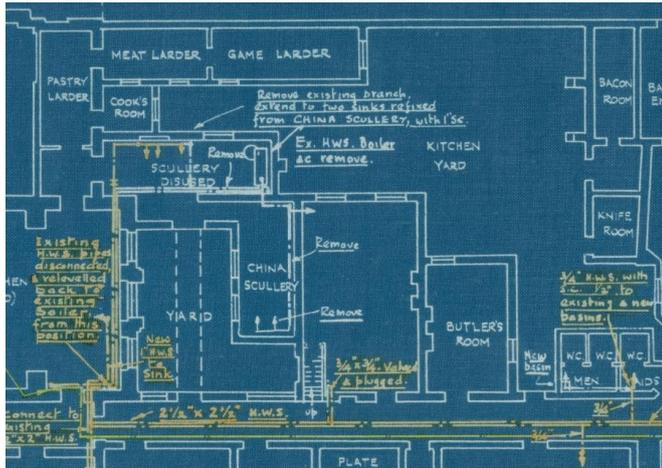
Extract from 1955 services drawing indicating proposed services works to East Wing – extract shows area of current proposed works.
